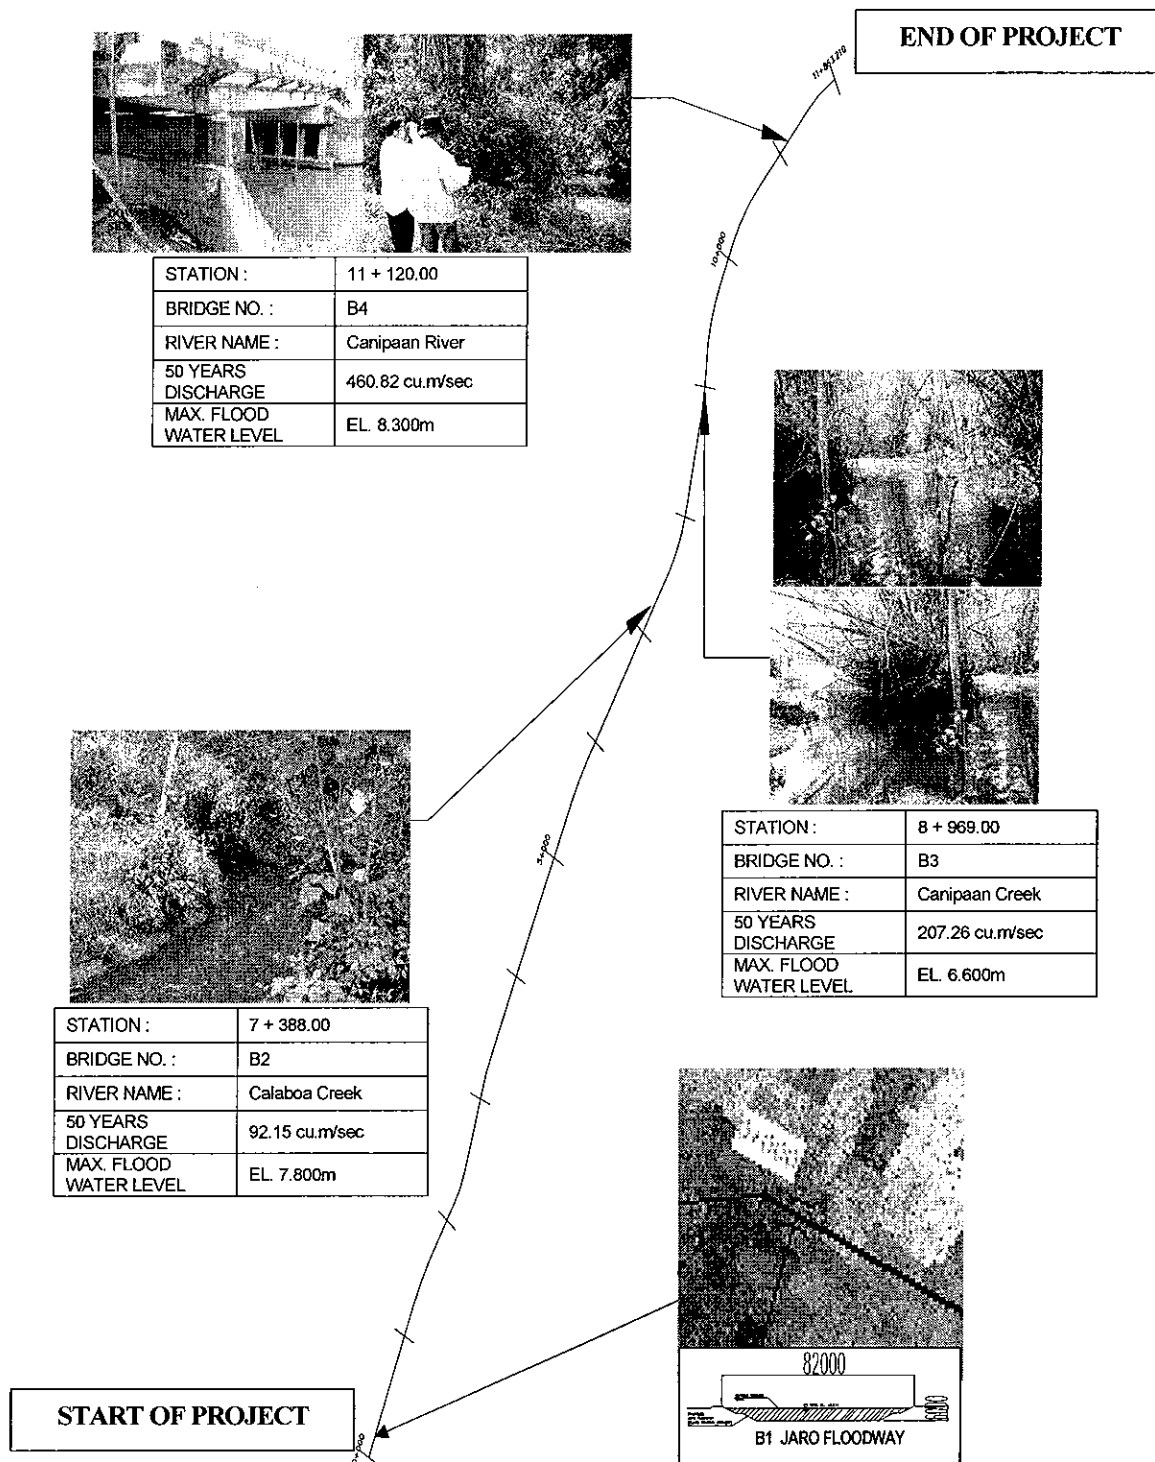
RIVER CONDITION AT PROPOSED BRIDGE SITES
